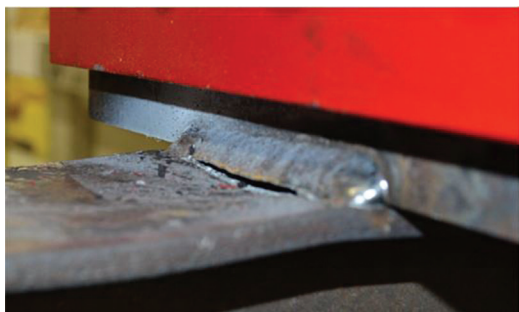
Weld fracture of W16×31 ST-E6 after testing (side 1).
